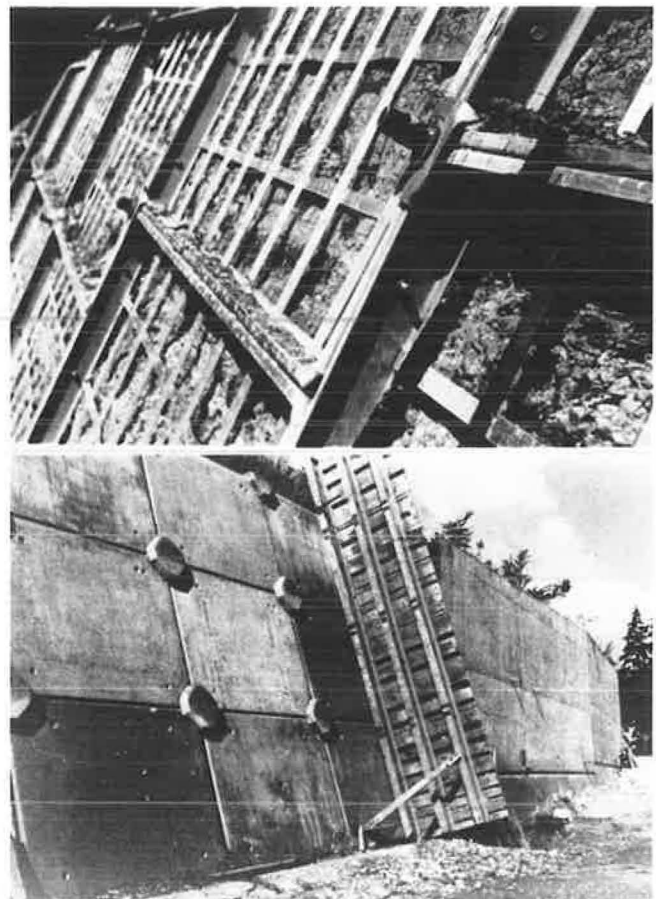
Prefabricated steel panels (top) and prefabricated concrete panels and nail connections (bottom).
